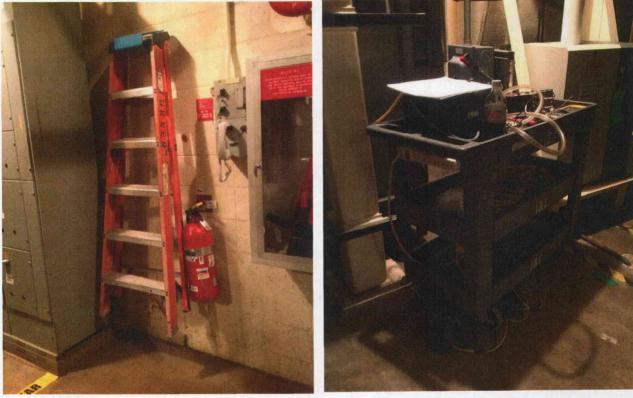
Fire Extinguisher not Restrained and Masonry Wall Photo 2 Cart Not Restrained
